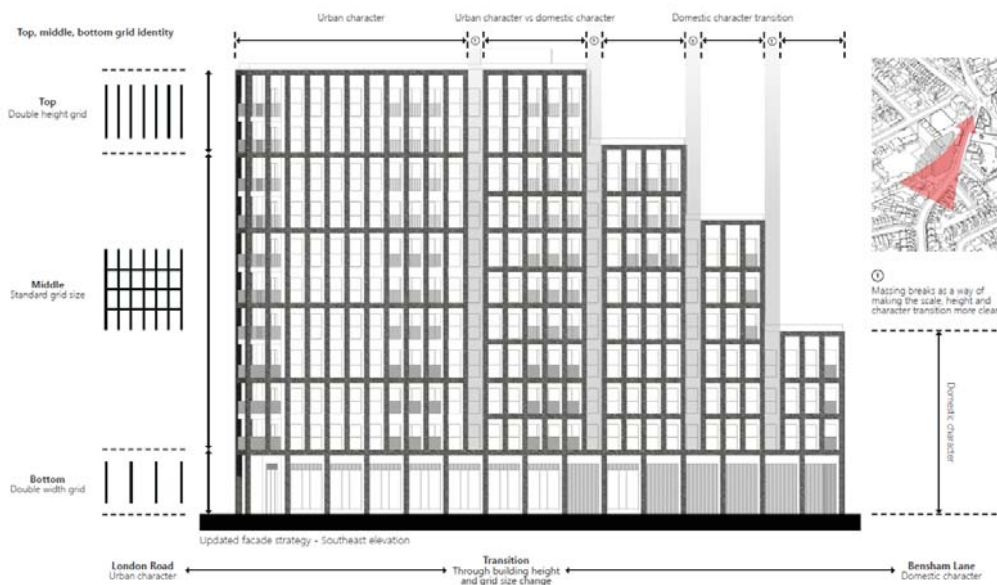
Proposed architectural grid approach of the building with commercial/community ground floor and residential on upper floors.
